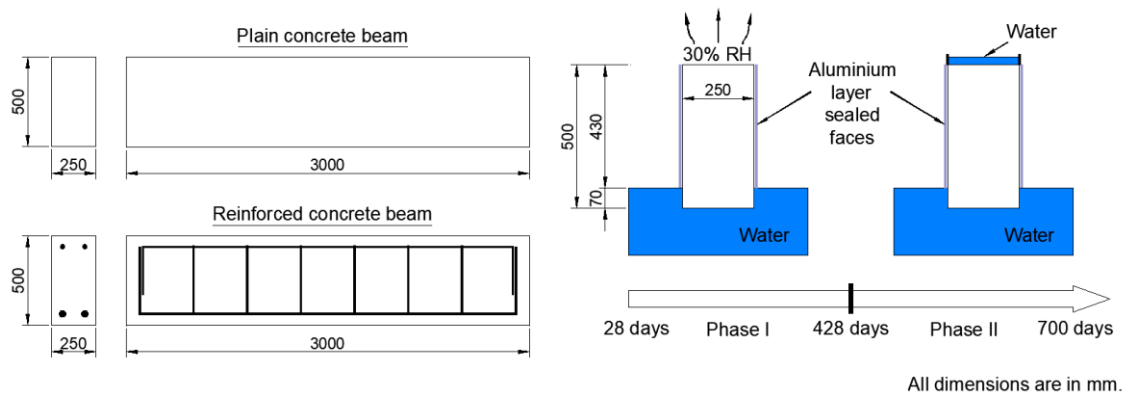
15 Water supplying conditions of plain concrete beam and reinforced concrete beams tested by Multon & Toutlemonde (2010)
